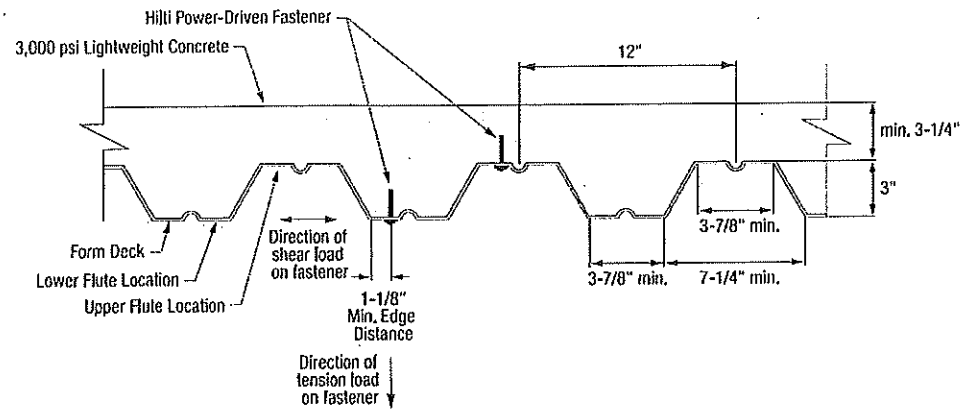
HILTI FASTENER LOCATIONS IN 3-INCH-DEEP COMPOSITE FLOOR DECK PANEL
